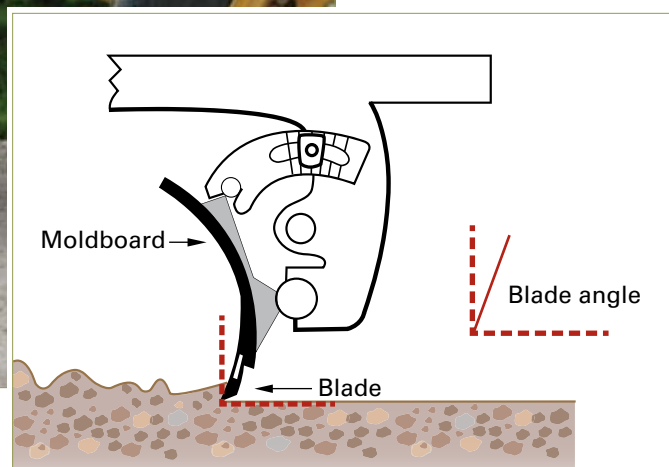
Moldboard in the cut position for regular grading (Adapted from LTAP-SD)
